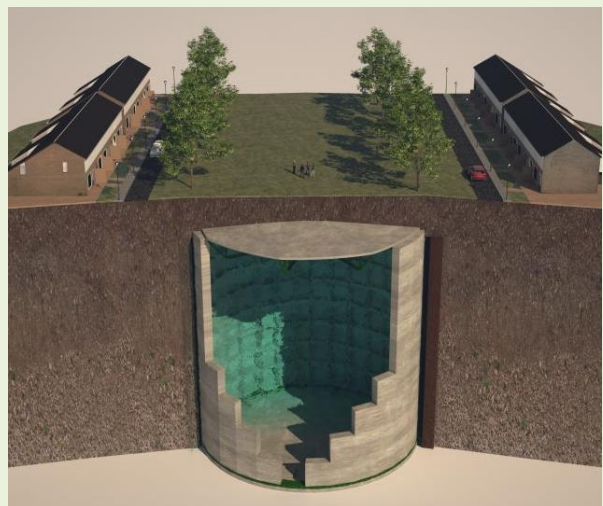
Ecovat underground tank storage (www.ecovat.eu)
